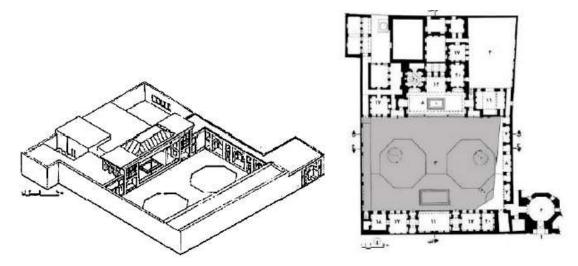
3d model and plan of Sheikh-ul-Islam house
